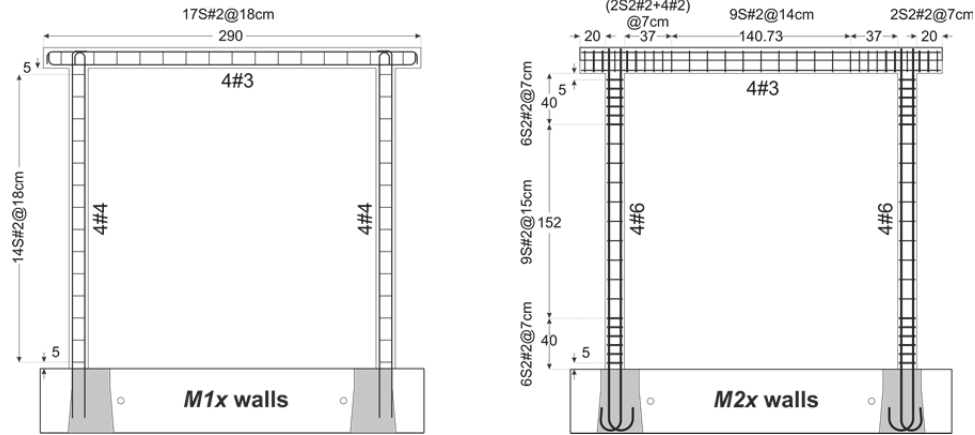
Wall reinforcement for specimens in set *M1* and *M2
